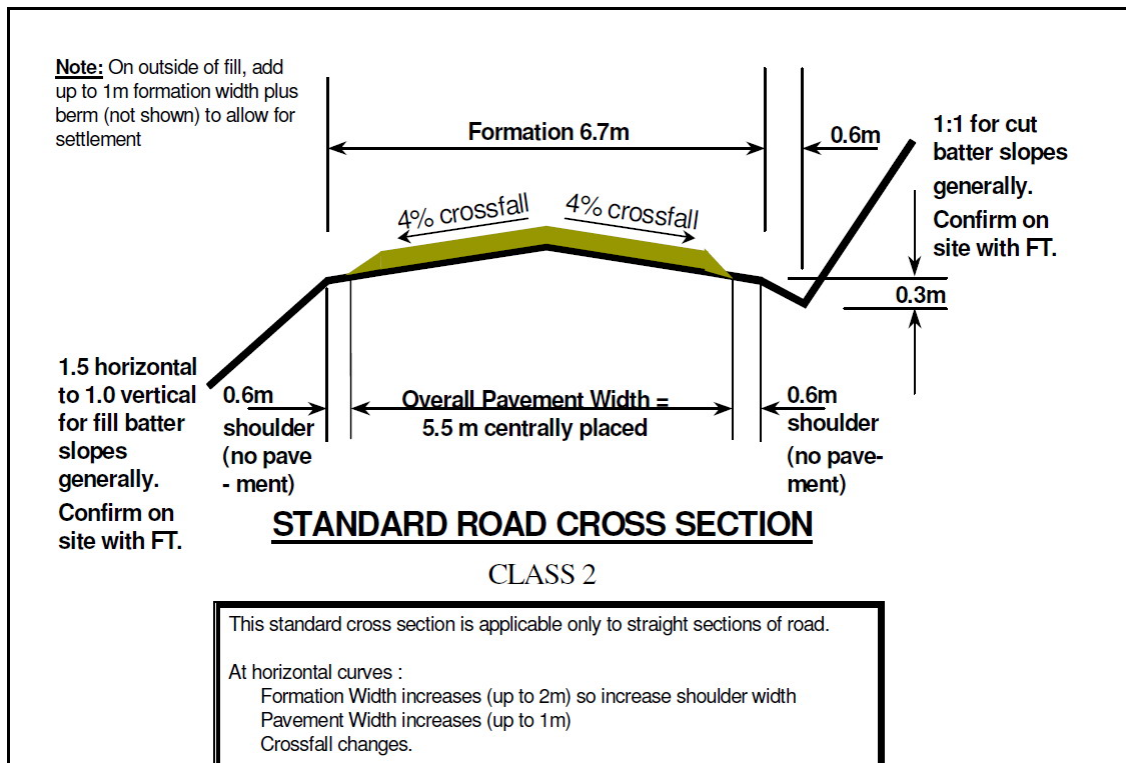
Typical Cross section for a Class 2 Forestry Road
